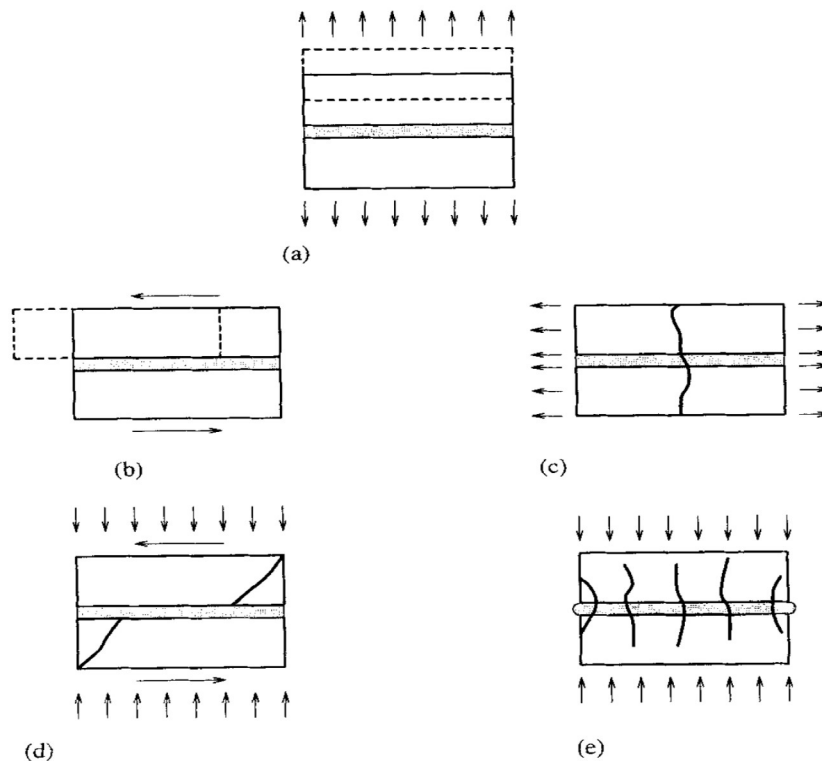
Failure Mechanisms of Masonry: (a) Joint Tensile Cracking (b) Joint Slipping (c) Direct Tension Crack in Brick Unit (d) Diagonal Tension Crack in Brick Unit (e) Masonry Crushing (Lourenço and Rots, 1997)
